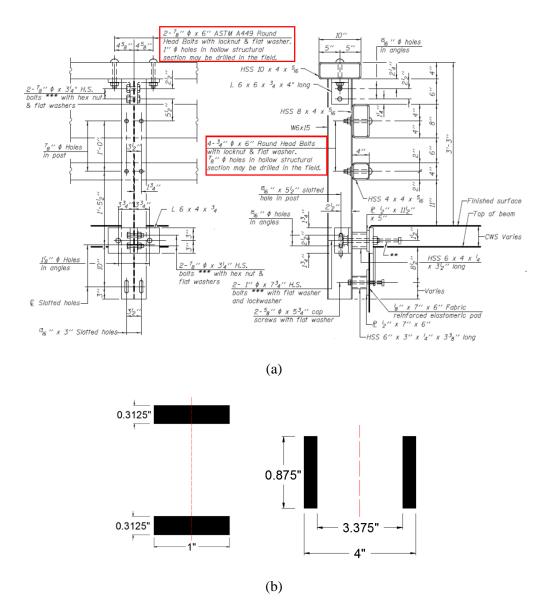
IL/OH Prototype Bridge Rail (a) CAD Details and (b) Dimension for Each Pair of Holes
